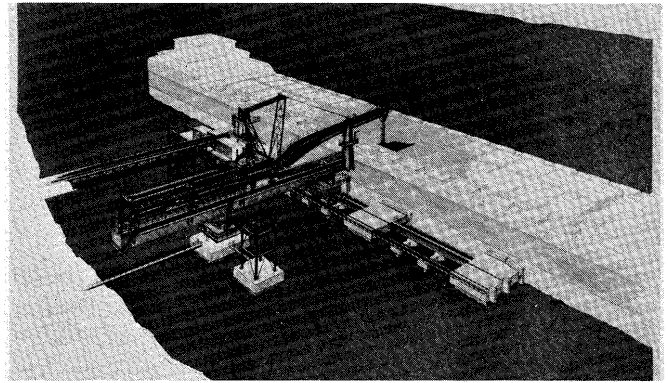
Pile Construction—At Trombetas, Brazil 4 breasting dolphins of vertical and batter pile construction and 8 vertical pile bents support Linear Loader runway. Capacity is 8,000 TPH bauxite.
